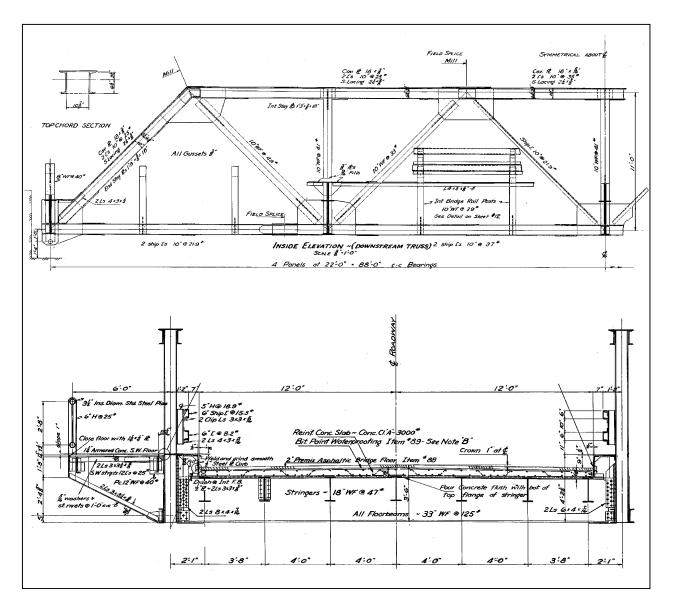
Warren pony truss elevation and section drawings (Source NHHD 1936, Bridge Drawings, Sheet 10 of 21; NHDOT Digital File 50146POP009.tif).
